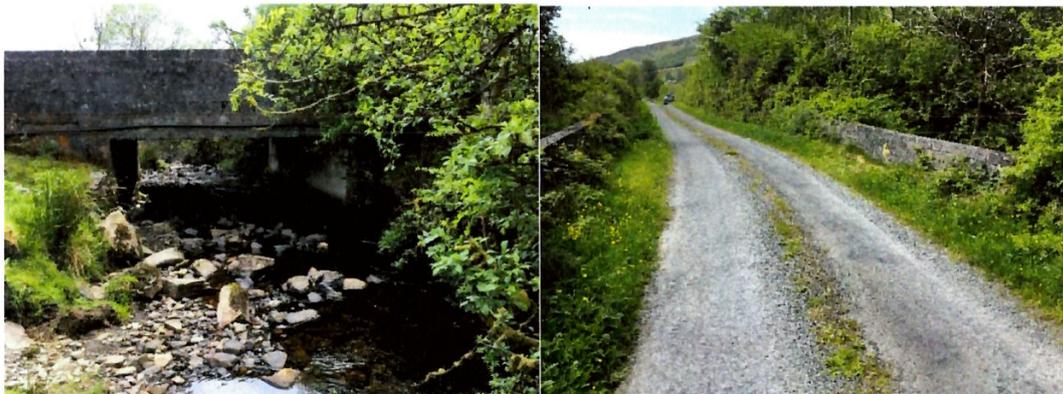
Bridge on Public Road Along Grid Connection Route
